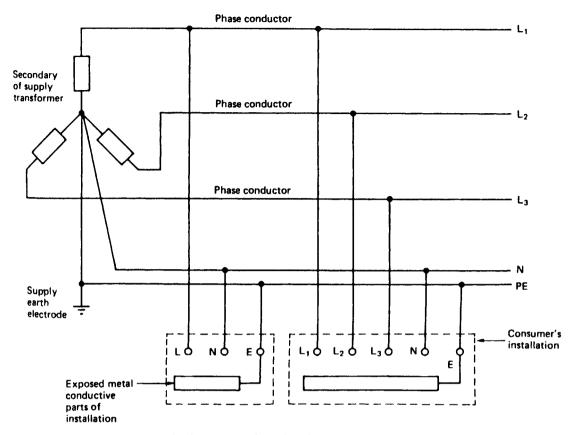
TN-S system: separate neutral and protective conductor throughout.
